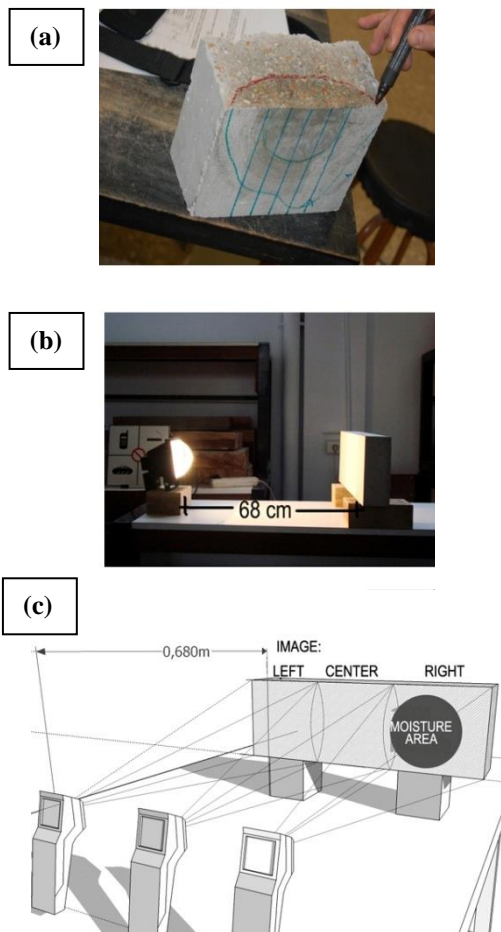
(a) Concrete specimen with which a destructive test was undertaken to measure the water penetration depth; (b) Distance between the heat source and the concrete specimen; (c) Position of the camera when the images were taken: left, centre and right.
